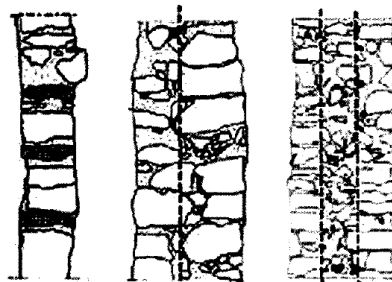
Typical stone masonry sections: one, two, and three leaves (Binda et al. 1999).
